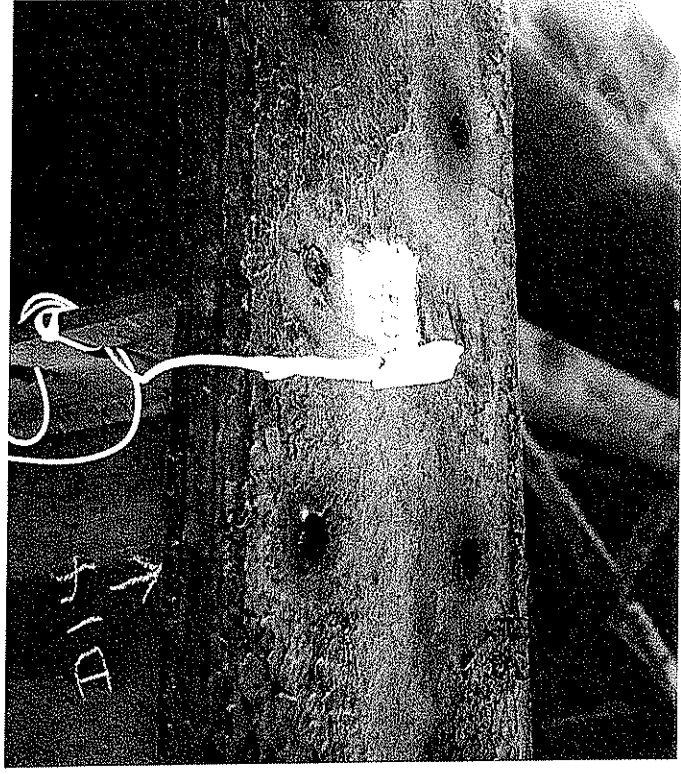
Span 2, Floorbeam 5 / West Top Chord, Gage Installations D16 -D17
